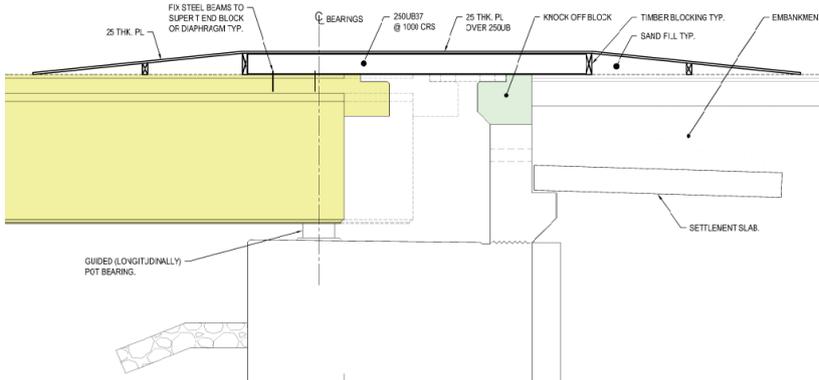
Temporary Repairs at the Trailing End of the Bridge Following a Design Level Earthquake
